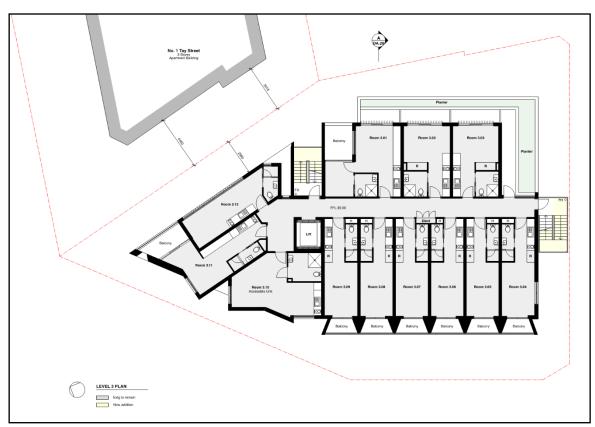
Proposed Level 3 Plan for 2 Anzac Parade, Kensington (Source: Applicant)
